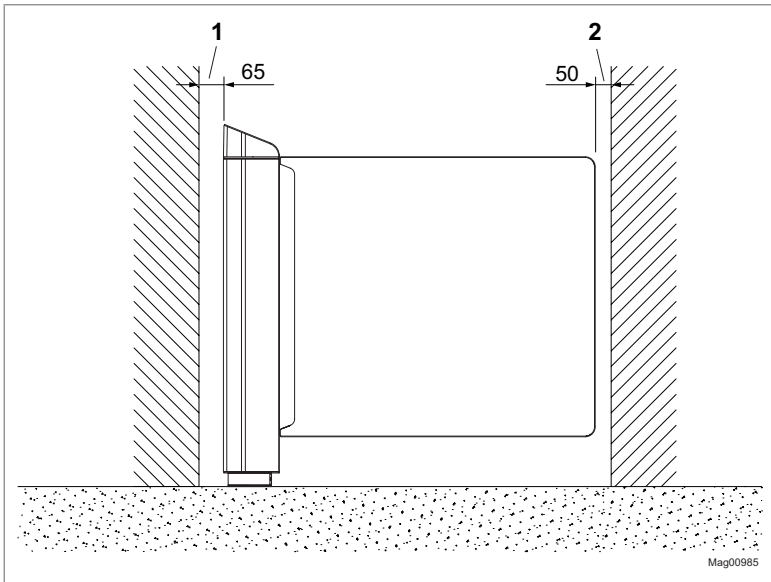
mSwing clearances to be maintained, displayed here is mSwing with wing
